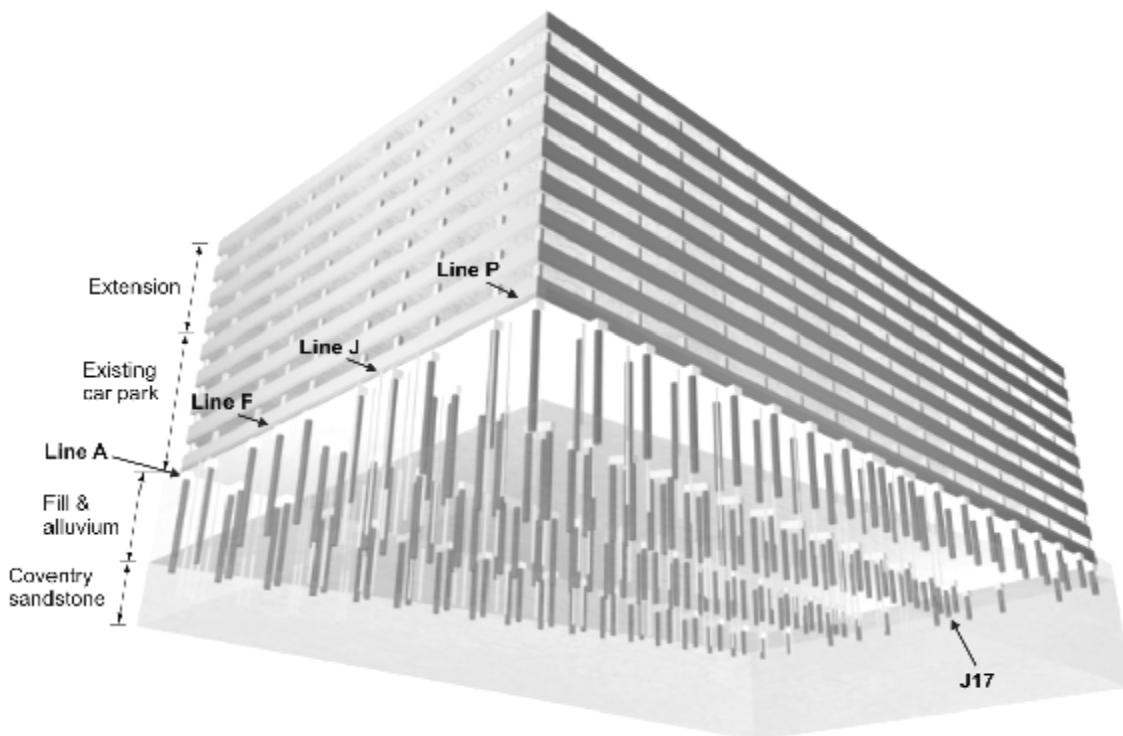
Schematic view of foundations and ground conditions for Leigh Mills car park
